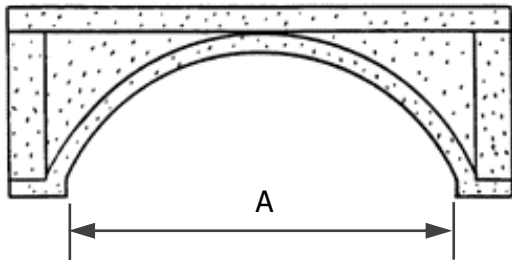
Profile view of a bridge under fill, or culvert-under fill.
